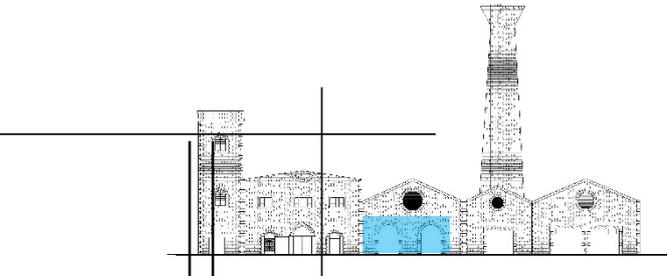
Concrete - arched openings, Barrack B, south-east elevation, 15 to 17A East wharf, KPT, Karachi.
